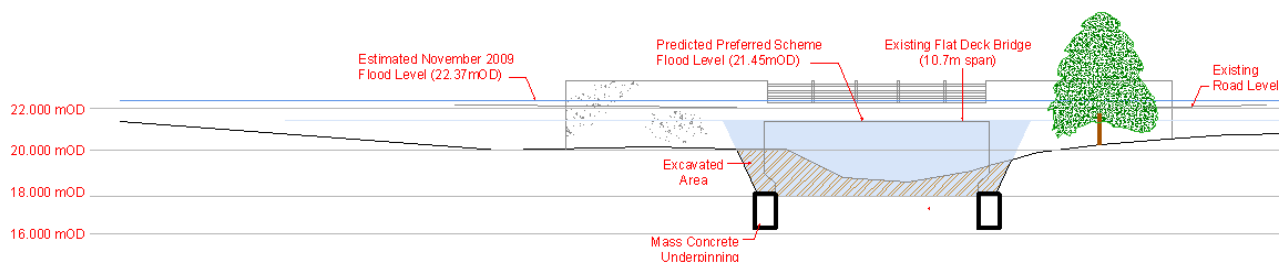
Proposed Works at the R446 Road Bridge in Craughwell
